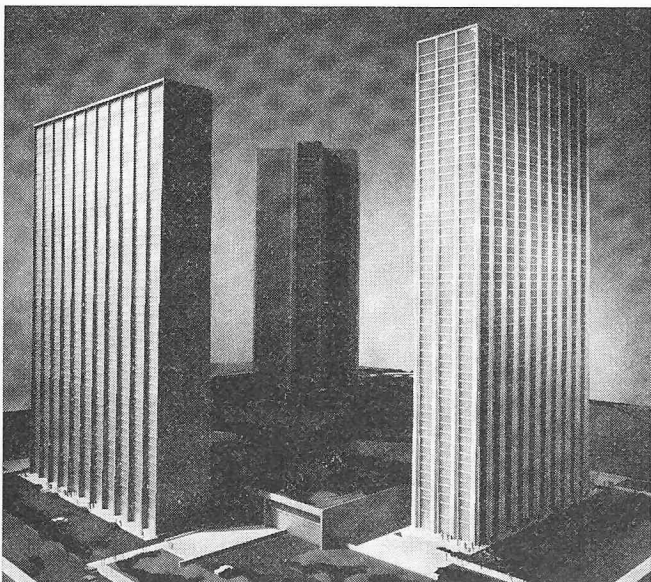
In the «Composite system» the exterior is formed of reinforced concrete: closely spaced columns and spandrels as well as the curtain wall
